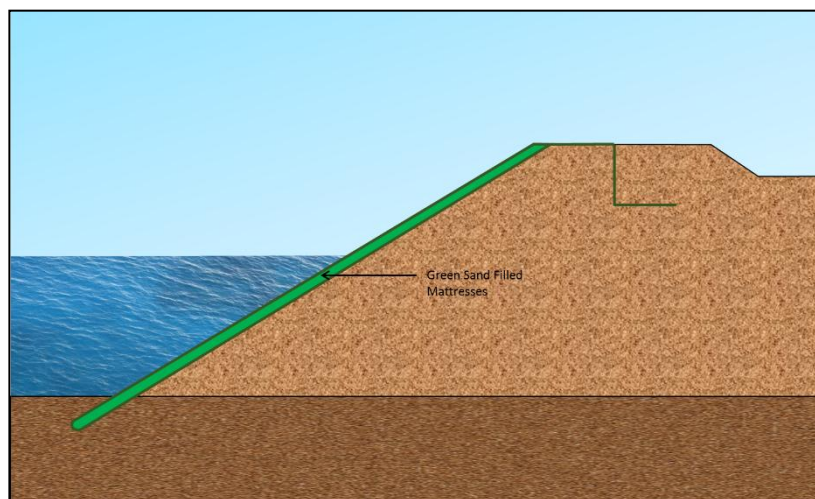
Typical cross section of proposed riverbank erosion protection at Jimah River.
